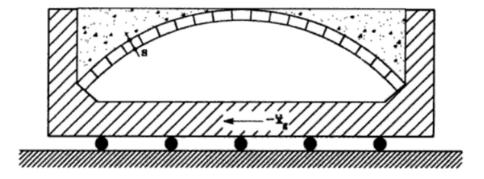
Structural Model of a stone arch under horizontal ground motion loading [27] (Arch Bridges, Anna Sipoli, University of Architecture, Venice).
